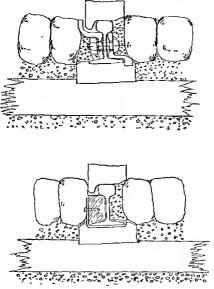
Permanent way, Belgian Light Pailways Mode of fixing rails in streets of towns.
